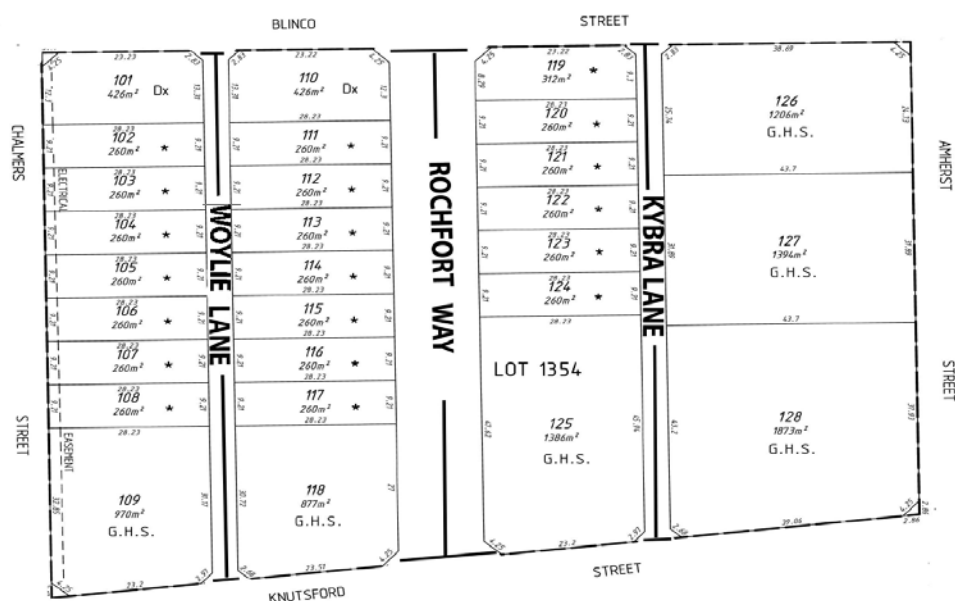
McMullen Nolan mark up plan showing the location of the proposed road.
